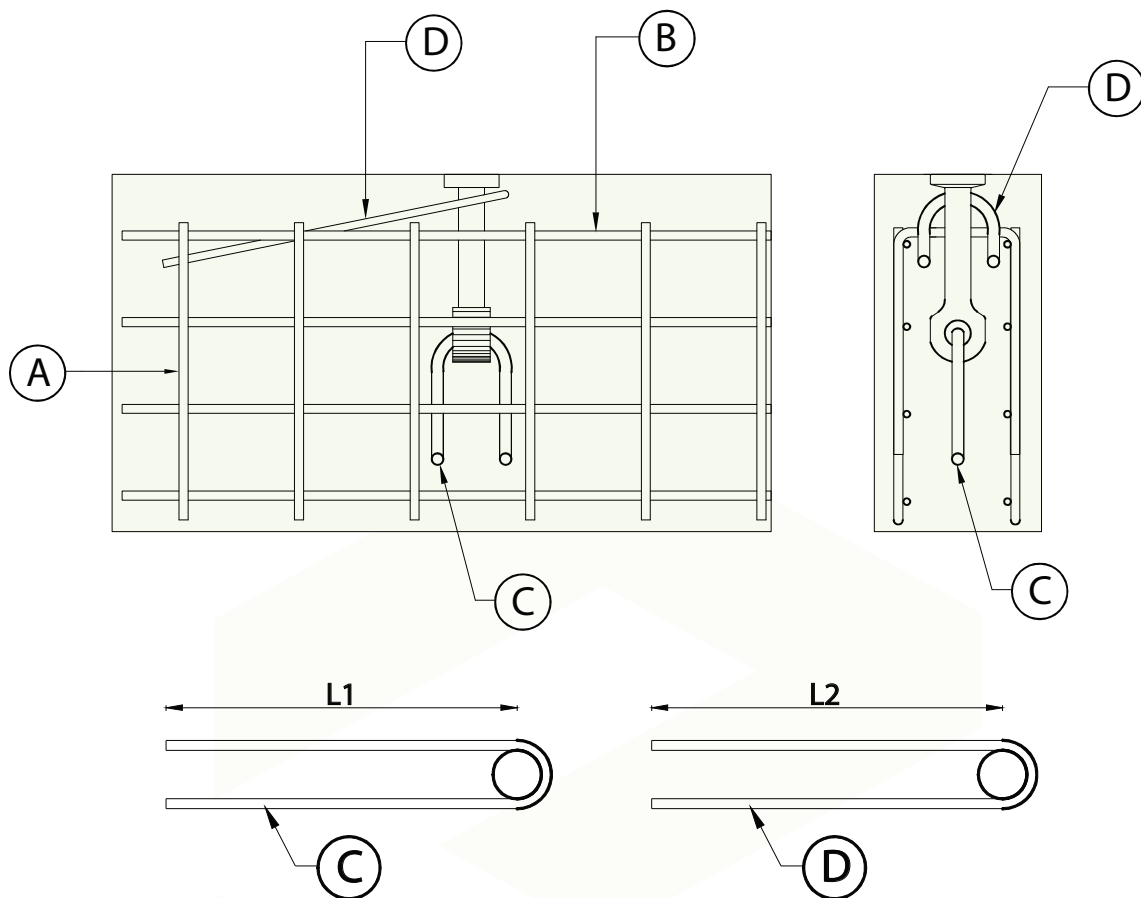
Diagonal Reinforcement for EEP lifting Anchor :
